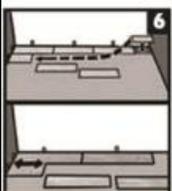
The cut piece from the previous row should be used to start the next row. This cut piece should be at least 12" (30cm) long. If the cut piece is less than 12" (30cm), start with a full plank which should be cut in half length-wise in order to achieve the staggered appearance. Be sure that all end joints are staggered in length at least 12" (30cm).
